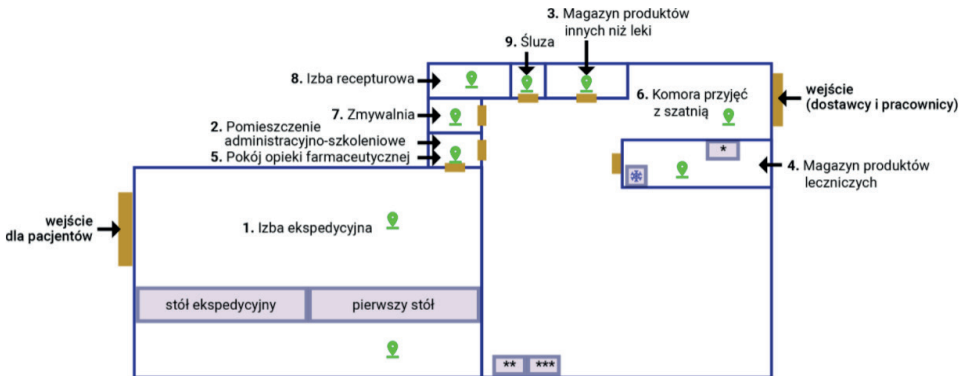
Floor plan of a public pharmacy with the layout of the premises
